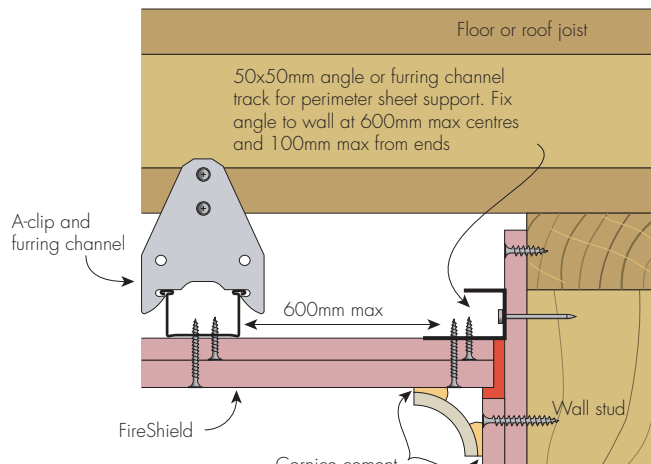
Fire Rated Ceiling to Wall - Alternate Detail
